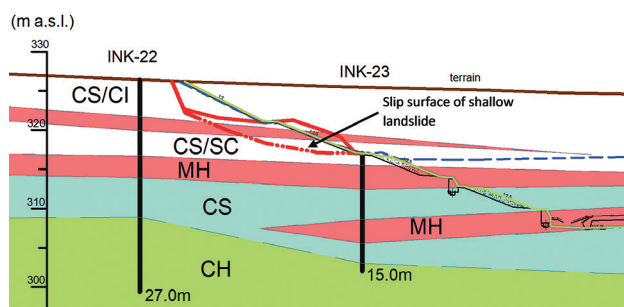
Simplified geotechnical profile 1 at 10.775 km showing the temporary excavation (blue line) and design excavation (green line).
